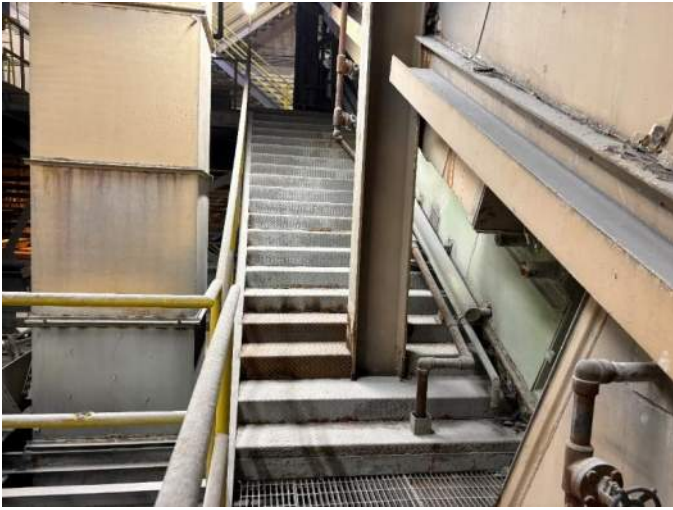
New stairs installed between Units 2 and 3 from barn door elevation to firing aisle
